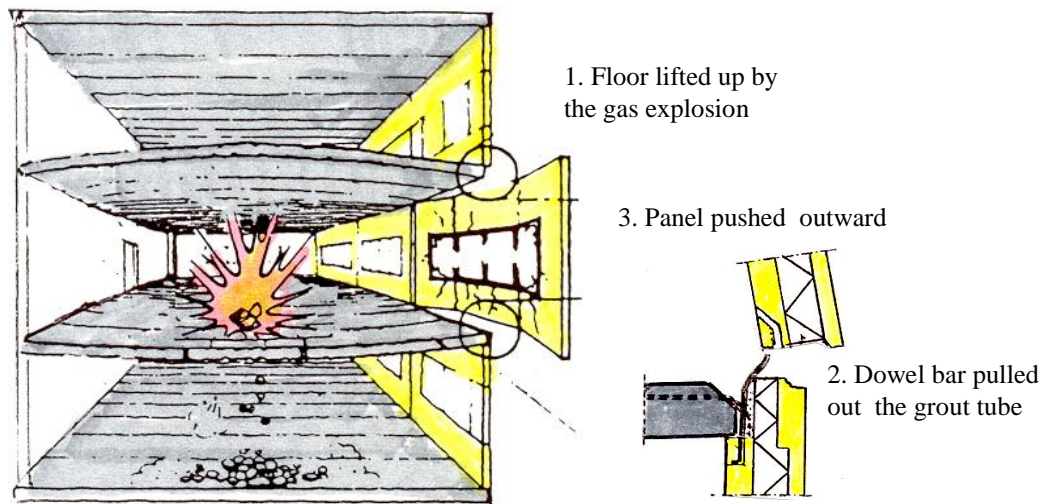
Scenario of progressive collapse after blowing-out of a load bearing façade panel due to gas explosion
